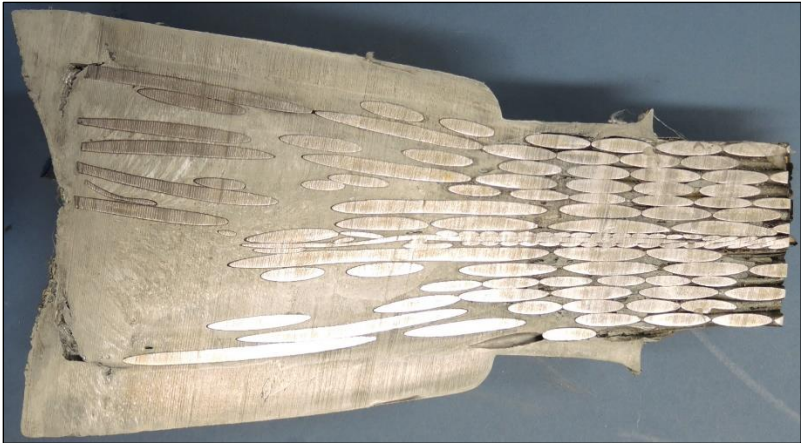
B4S_G casting cut open after load test to (photo: Socotec).
